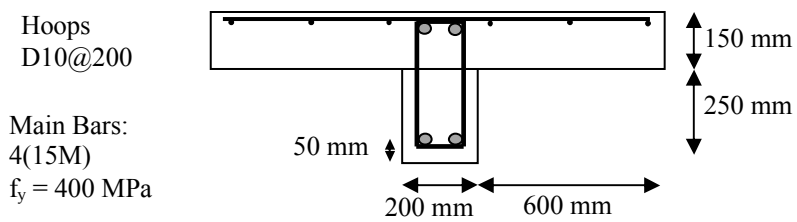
Beams Cross-Section of the Secondary Frames.
